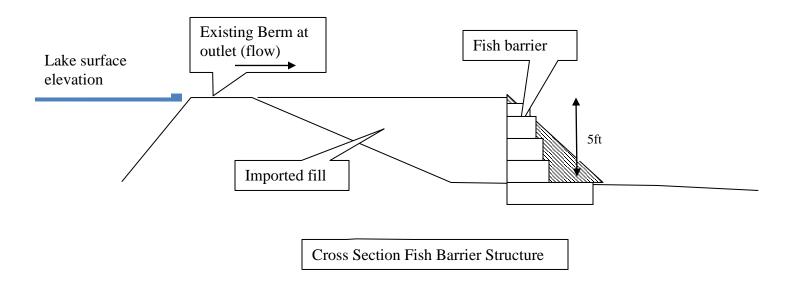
Cross section of the proposed fish barrier at the outlet of Van Houten Lake.
